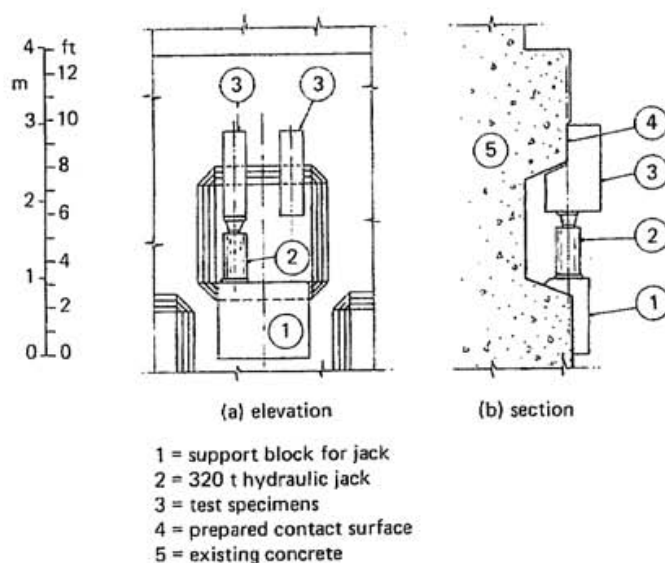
Ross dam. *In situ* bond test arrangement [7.43].
